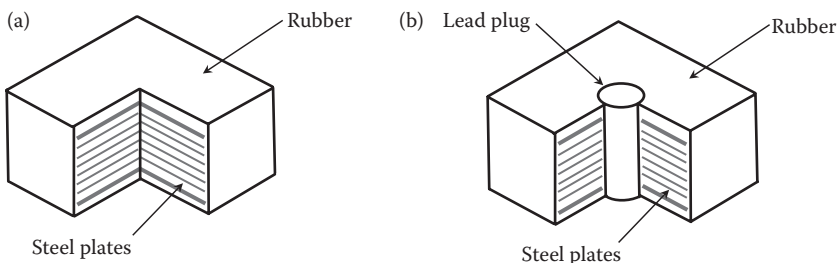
Cut-away view of (a) laminated rubber bearing and (b) lead-rubber bearing.
